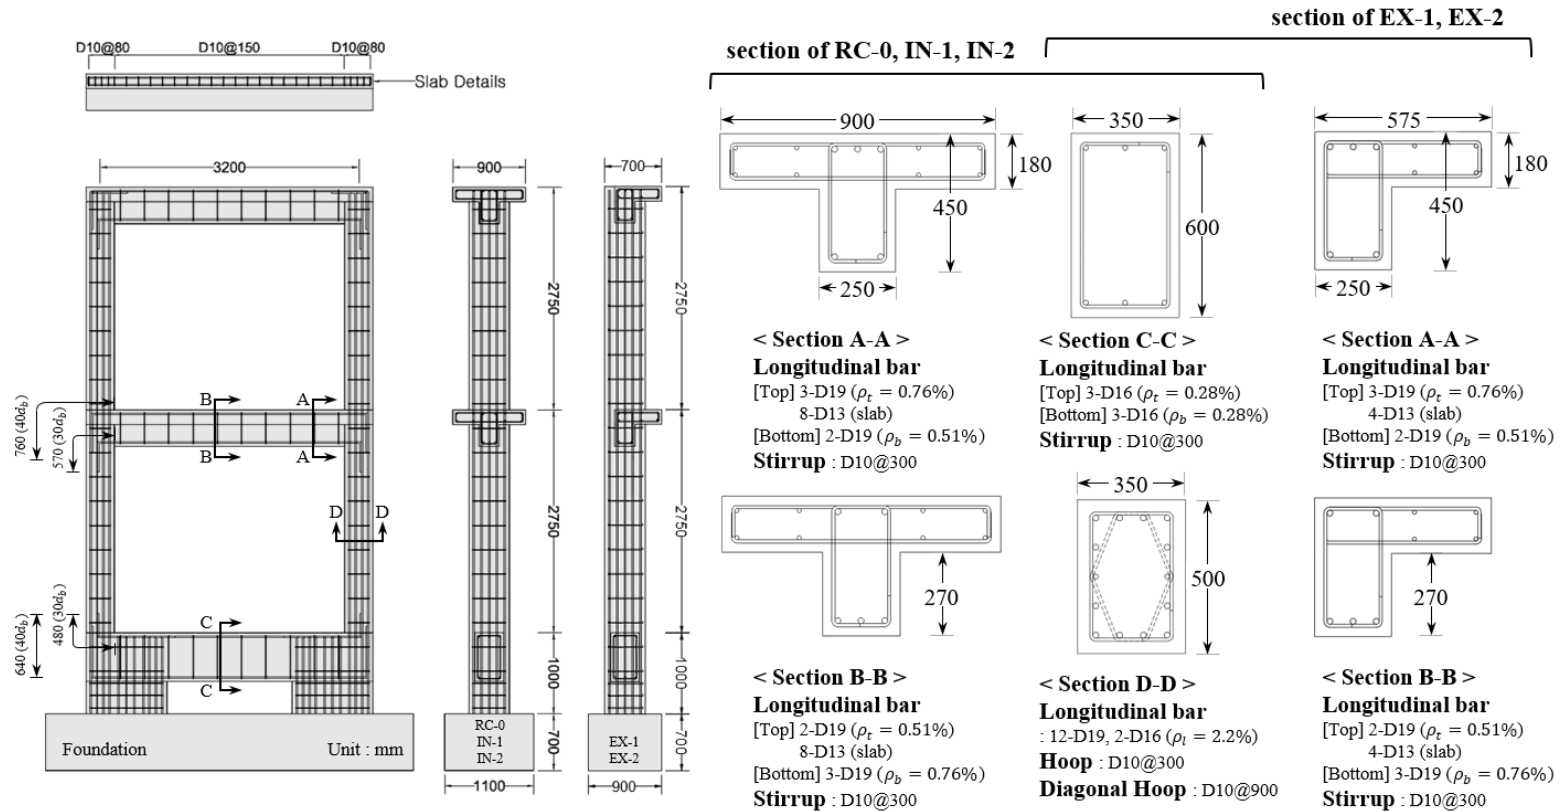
Dimensions and reinforcement details of the RC moment frame specimens for retrofitting
